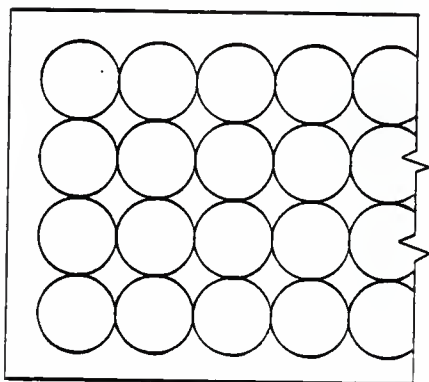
Layout of 4 Bins Wide Concrete Battery.
